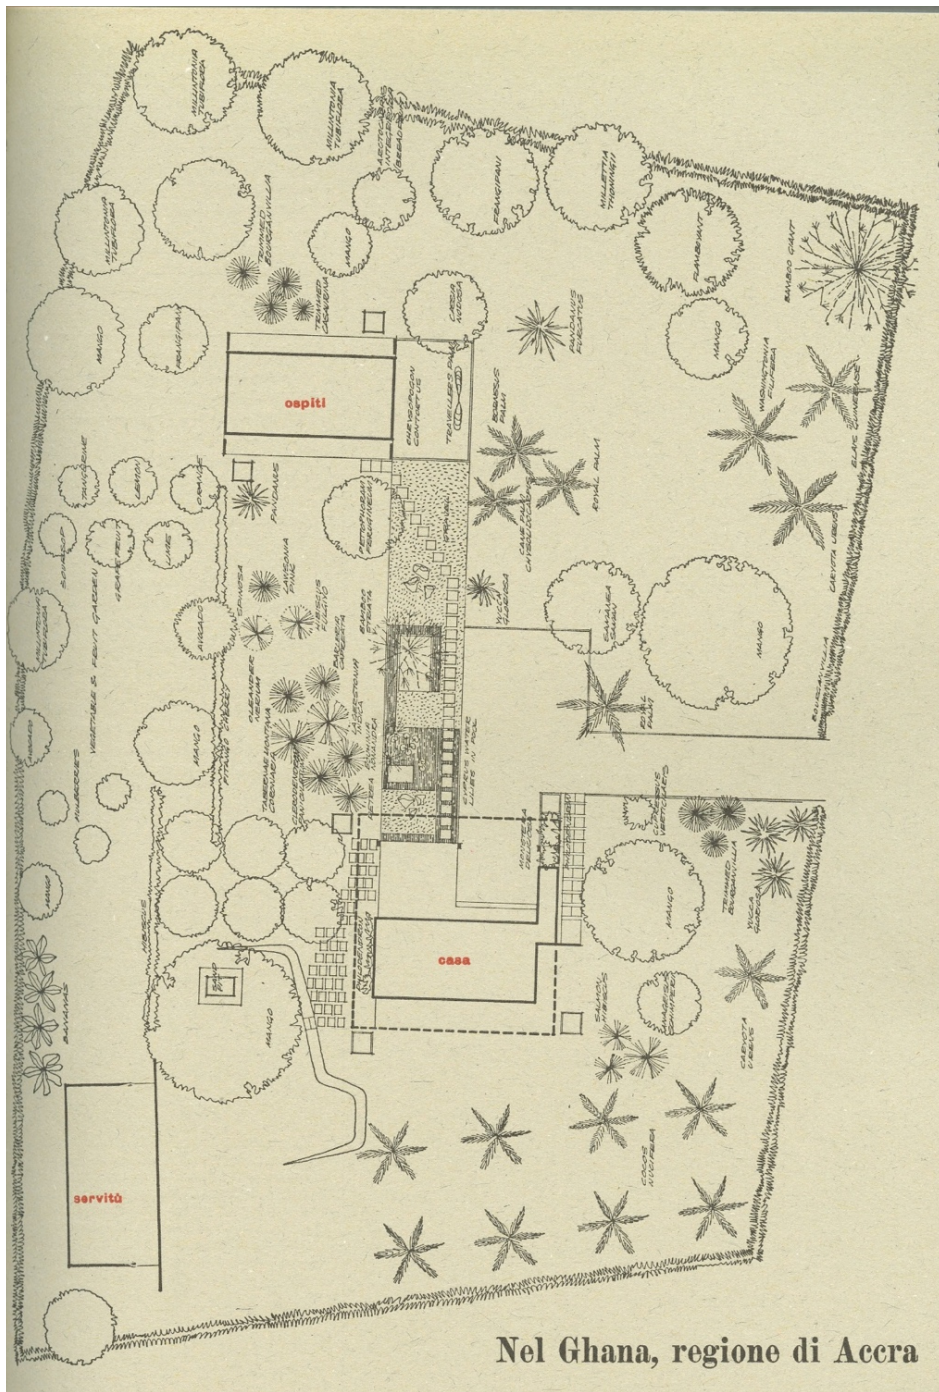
Site Plan, Kenneth Scott House, Accra 1961²⁷⁸
